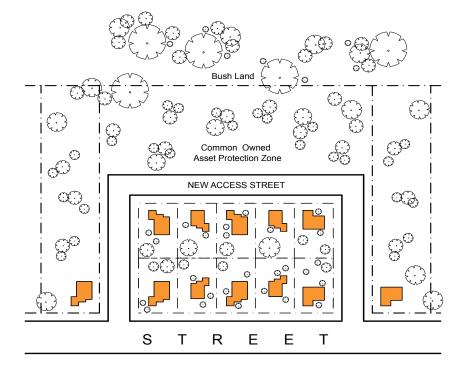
Subdivision of 10 lots, sharing access road between development and APZ.
